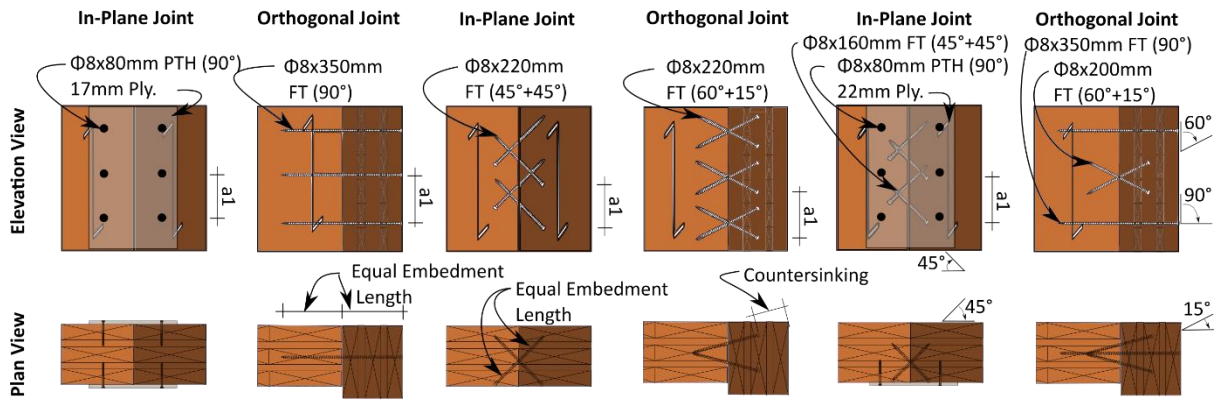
STS connection detailing: (a) tests CW-2 and CW-7, (b) test CW-5, and (c) test CW-6
